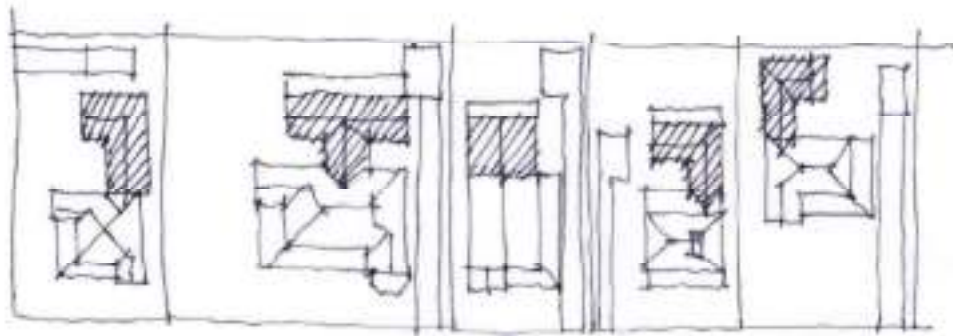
Extensions to existing buildings are best placed to the rear using linked pavilions, skillions and sympathetic formal construction.
